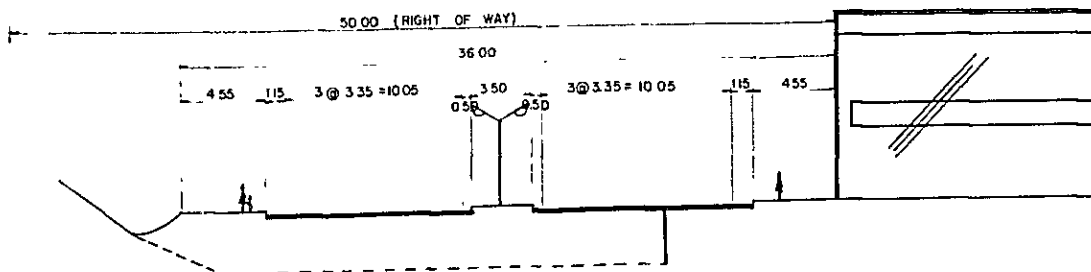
WIDENED CROSS SECTION OF VIA CERRO ANCON(2)
